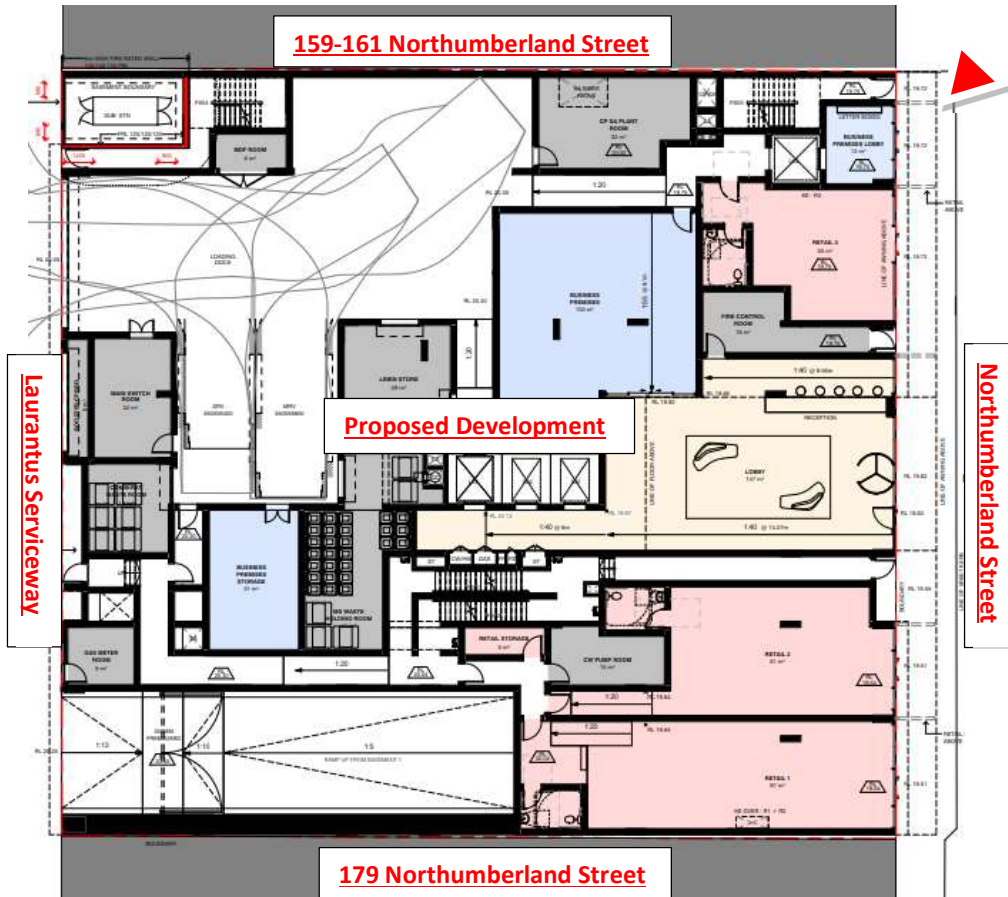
Proposed Architectural Layout (Courtesy of PTW)
